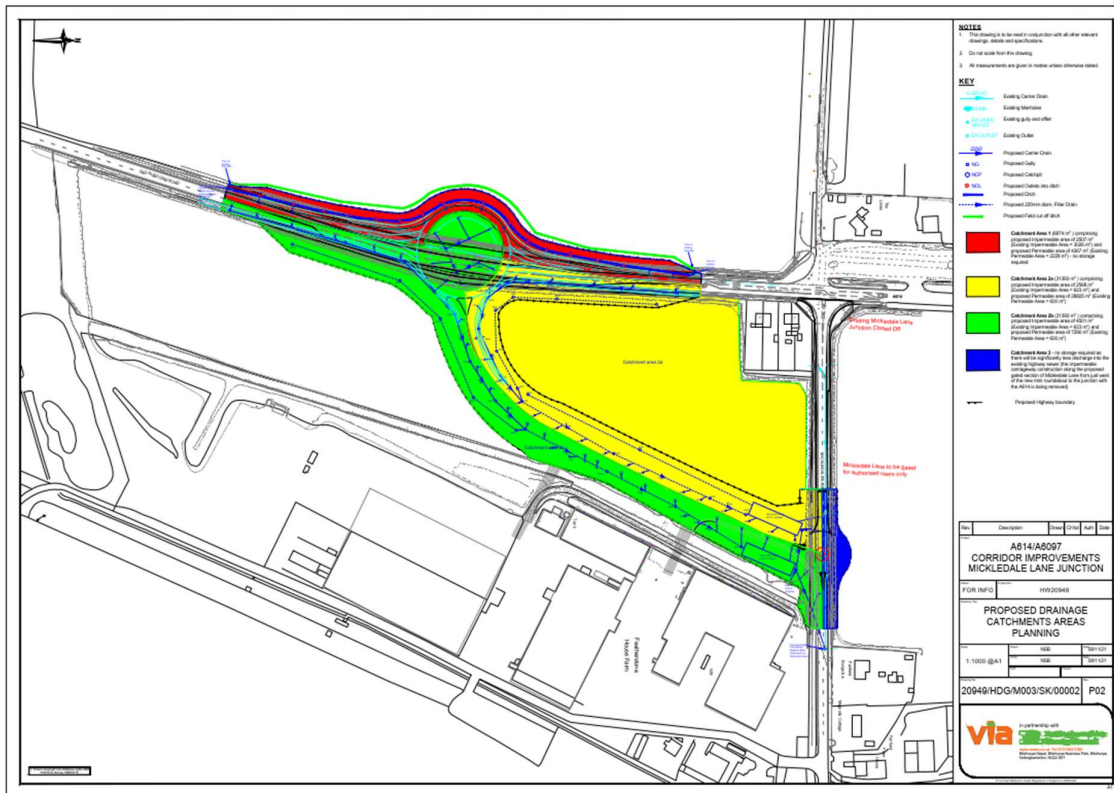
Mickledale Lane Junction Proposed Drainage
